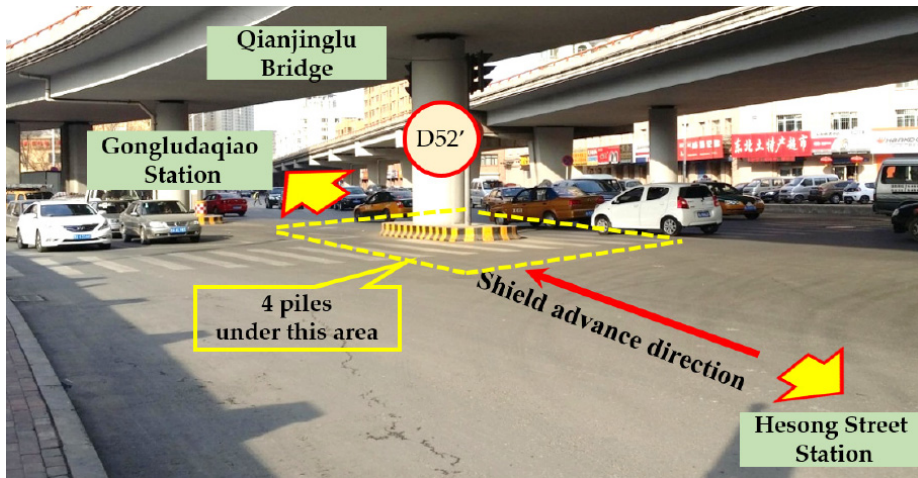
Plan of the project (Wang and Yuan, 2023)
